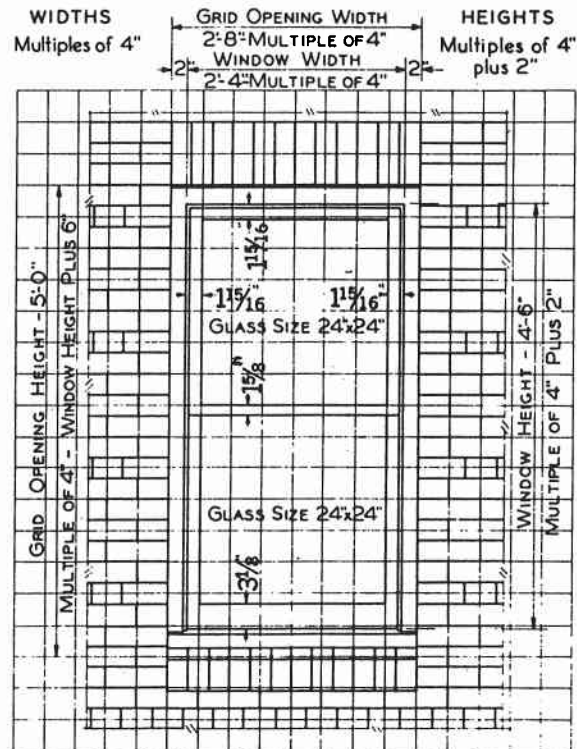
Relation of 1½ inch double hung insulating-glass window to grid opening — brick wall.
